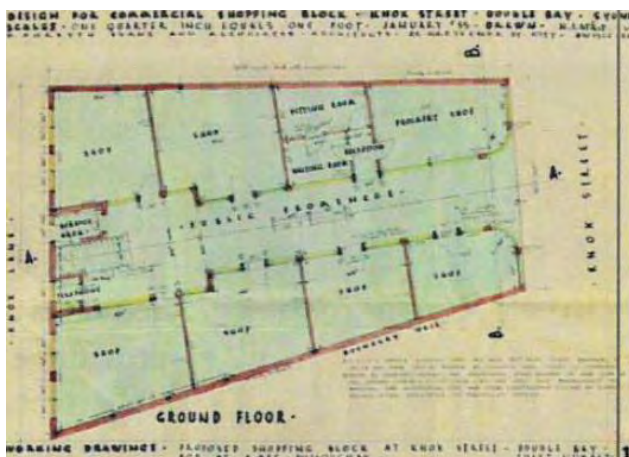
Architectural drawing ground floor layout prepared by Douglas Forsyth Evans and Associates for the subject site, c.1955.
